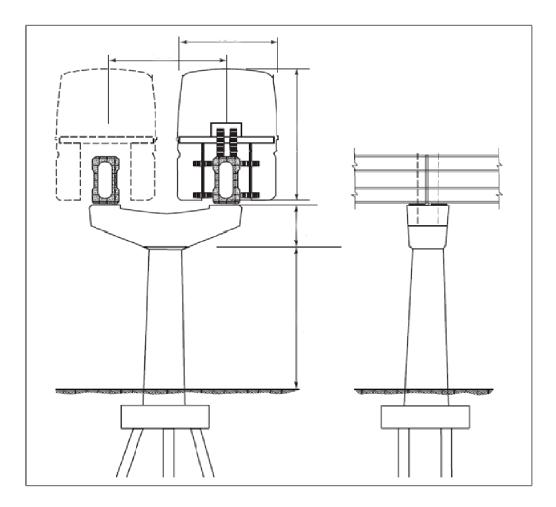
Typical straddle monorail structure, (Grava, 2004)
